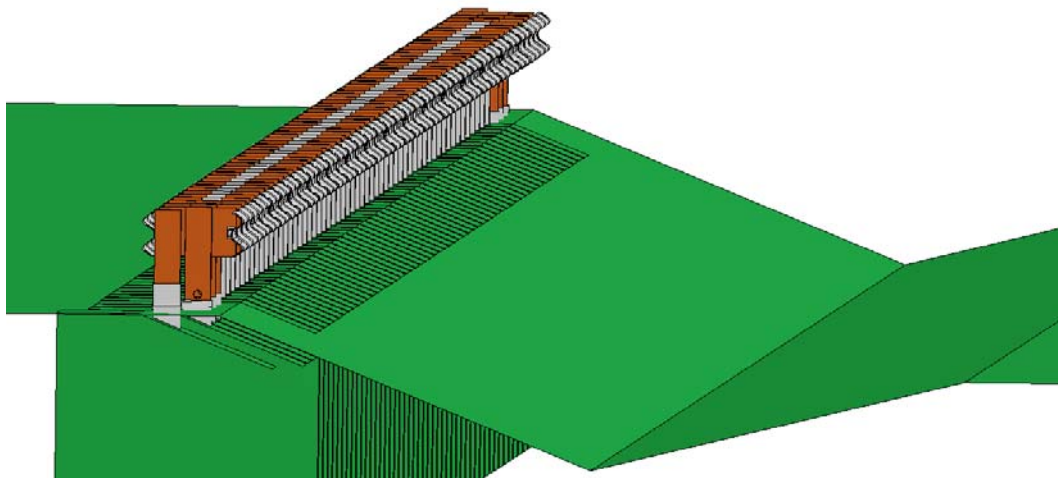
FE model of the double-faced guardrail installed on a 2.5H:1V slope.
